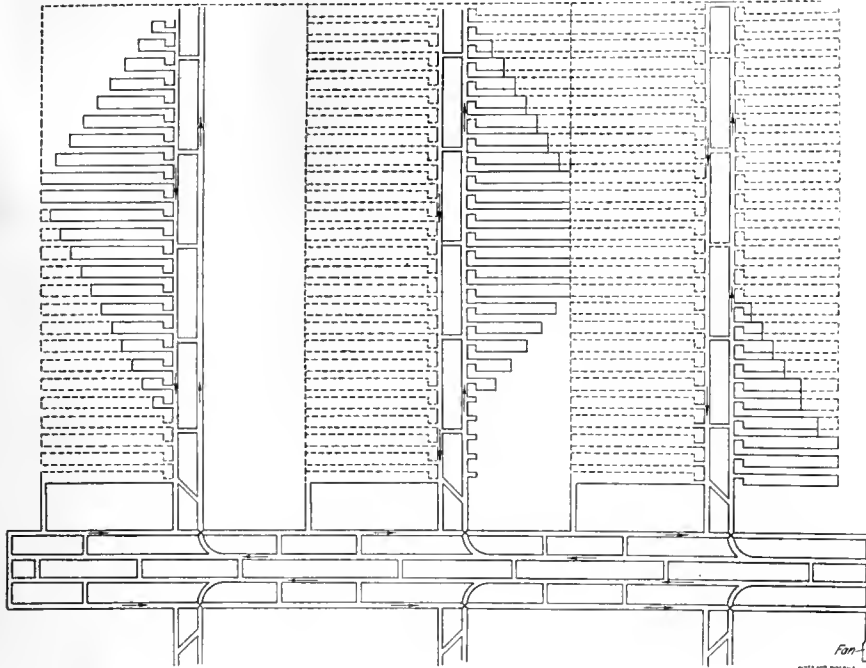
PLAN OF PILLAR DRAWING USED IN PITTSBURG DISTRICT
